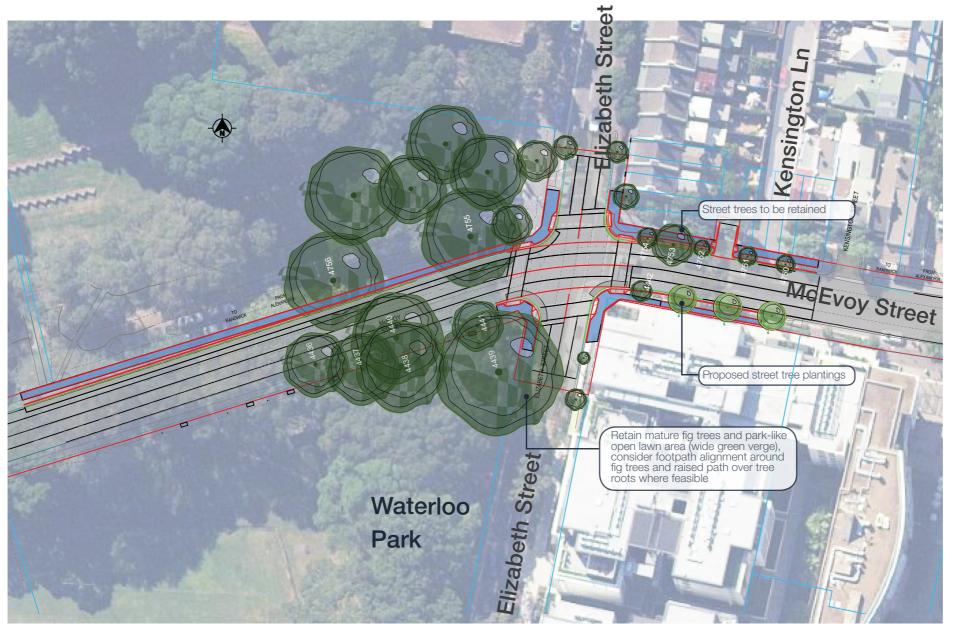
Zone 3 - McEvoy Street and Elizabeth Street
